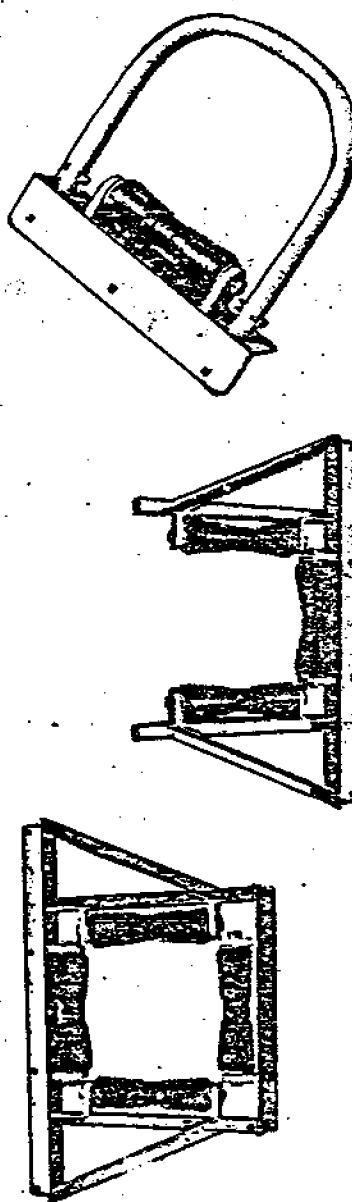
Pile Rollers (Marine Docks, p. 10)
